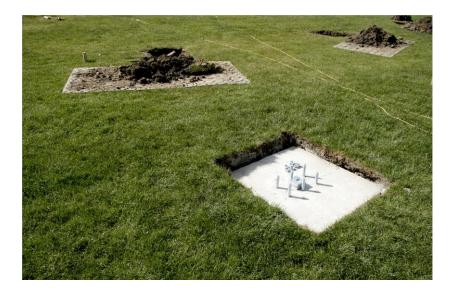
Concrete Footings Detail. Source: <u>0111 architecture gallery</u> 21 August 2013 < http://www.0111.com/archgallery/ >
